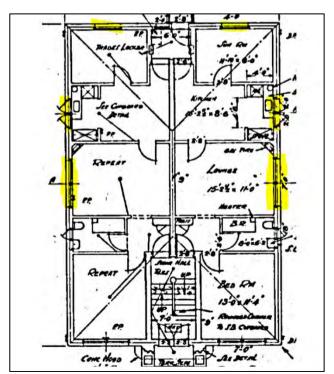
Floor plan of No. 10 Bradly Avenue Source: Walsh Analysis
